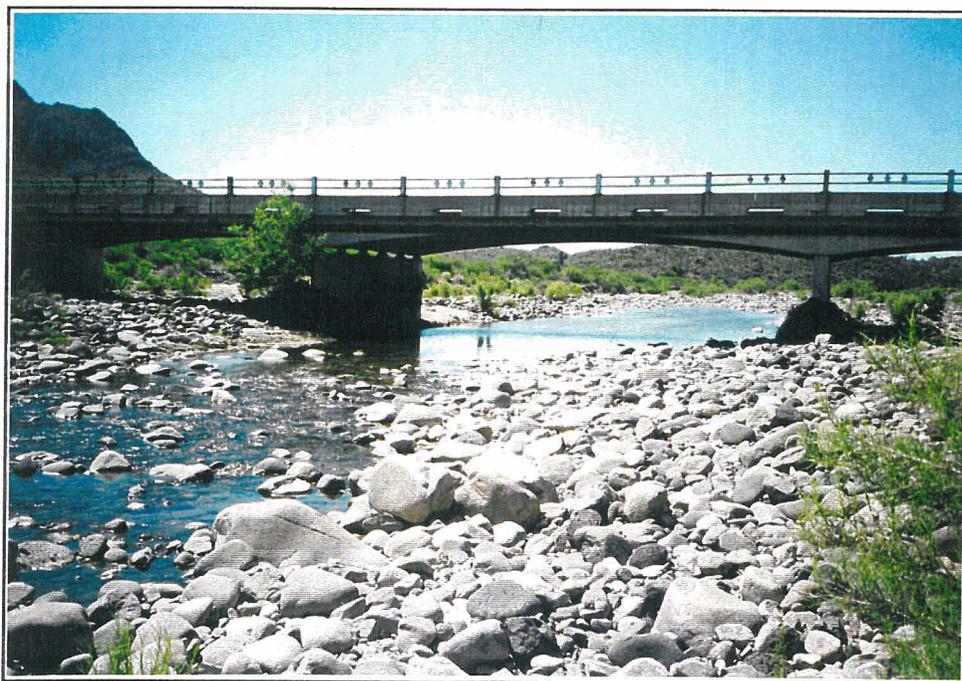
View of upstream face of bridge. Note low flow channel between piers 3 and 4.
